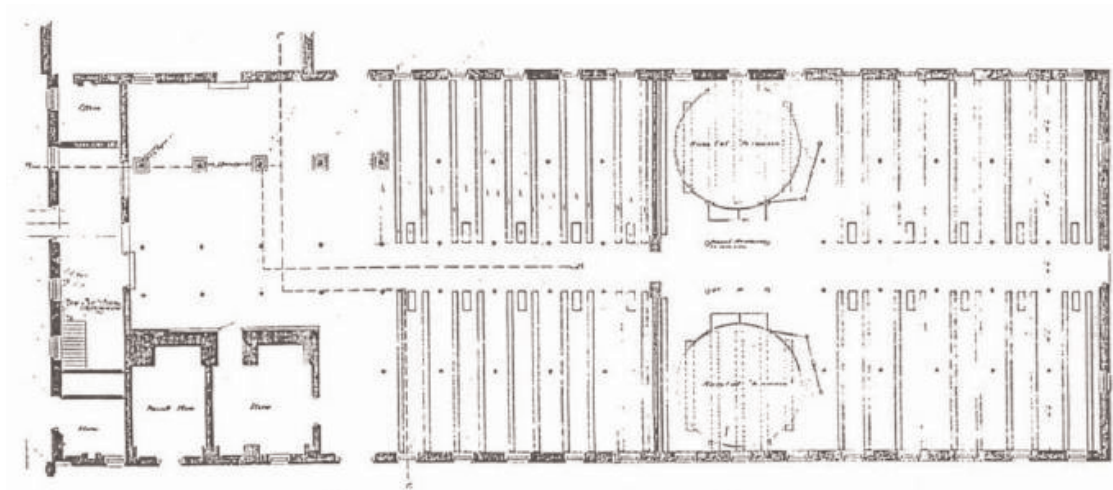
1860 plan of the ground floor of the Samuel Wyatt 1782 Brewery before it was altered to become a clothing store.
